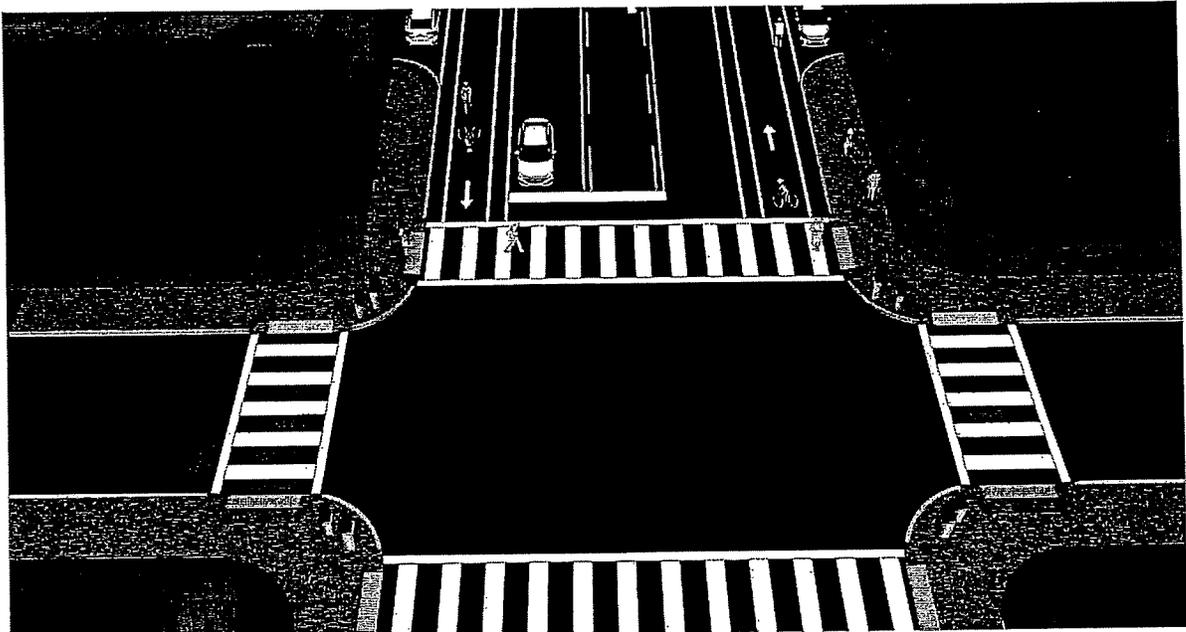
This rendering is an example of how Keller Ave could look. See Appendix A for specific preliminary plans showing lane widths and other details
